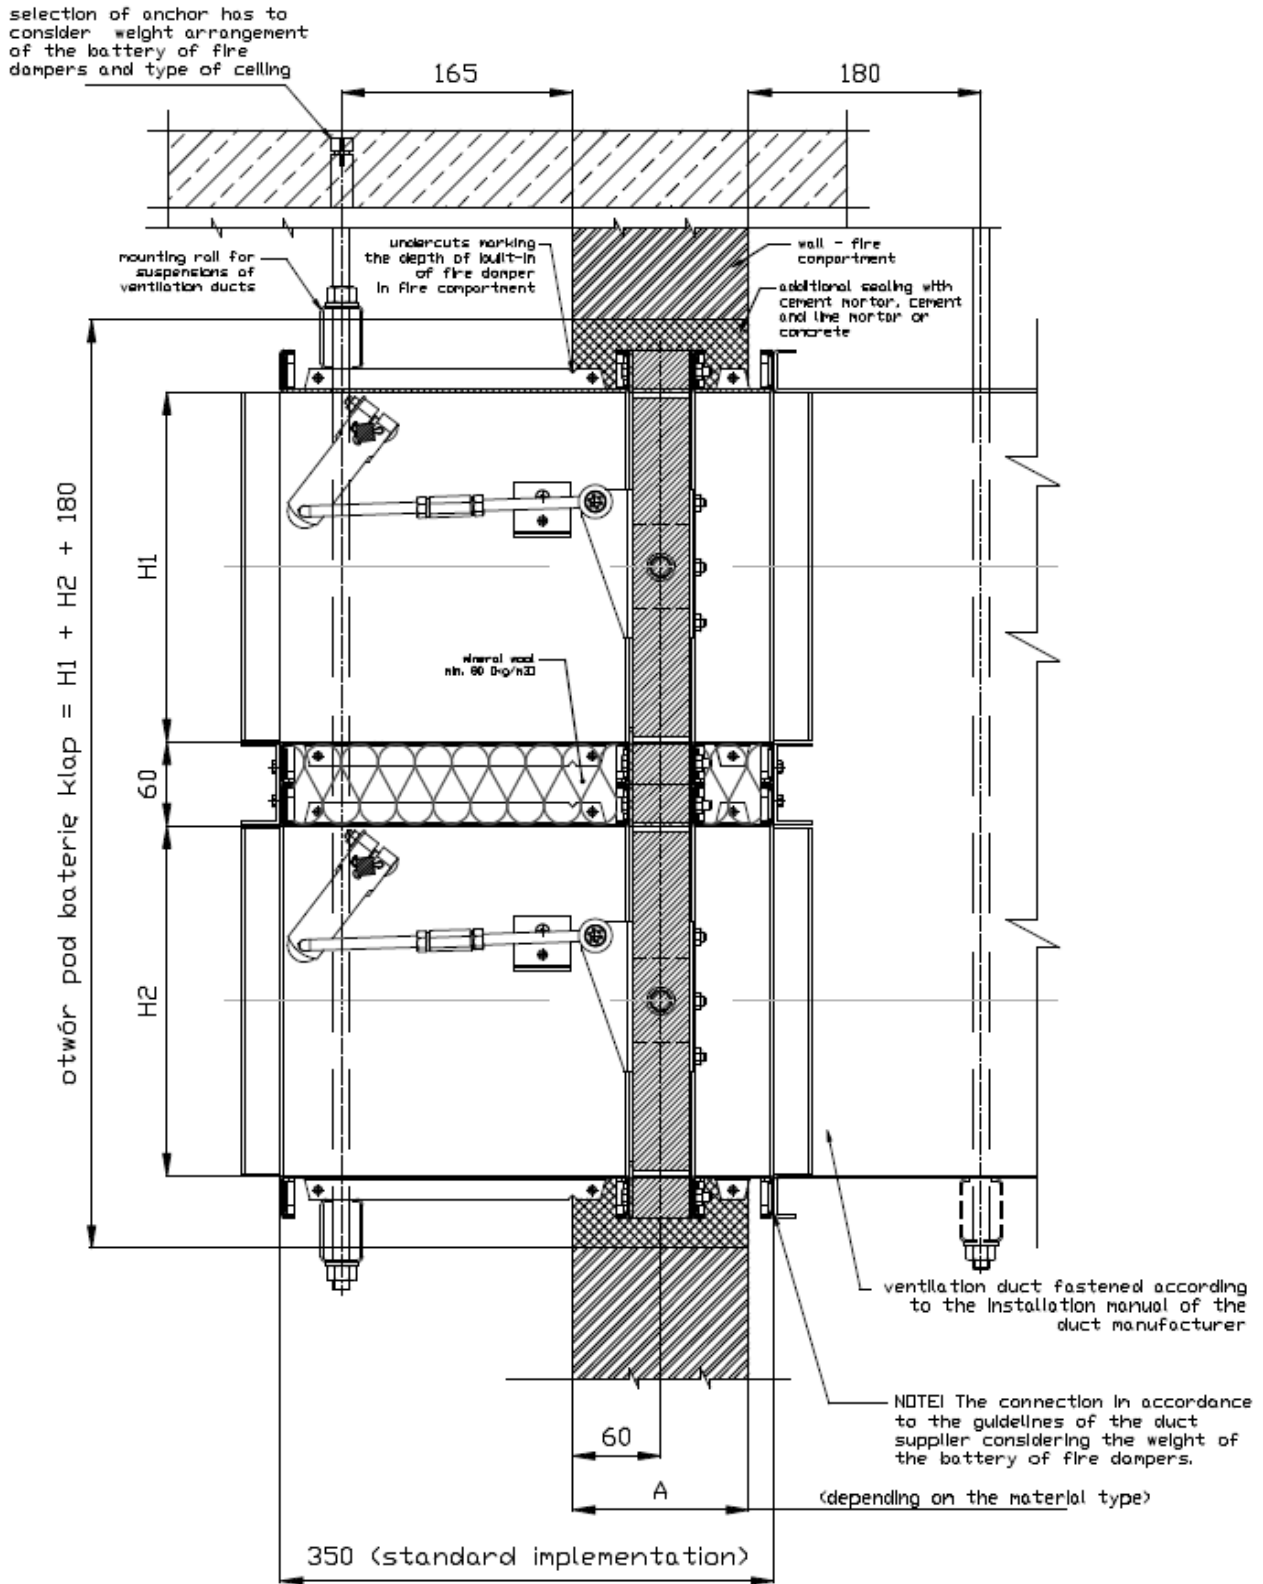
Installation of a battery consisting of two fire dampers KWP in vertical arrangement in rigid compartment – side view.
